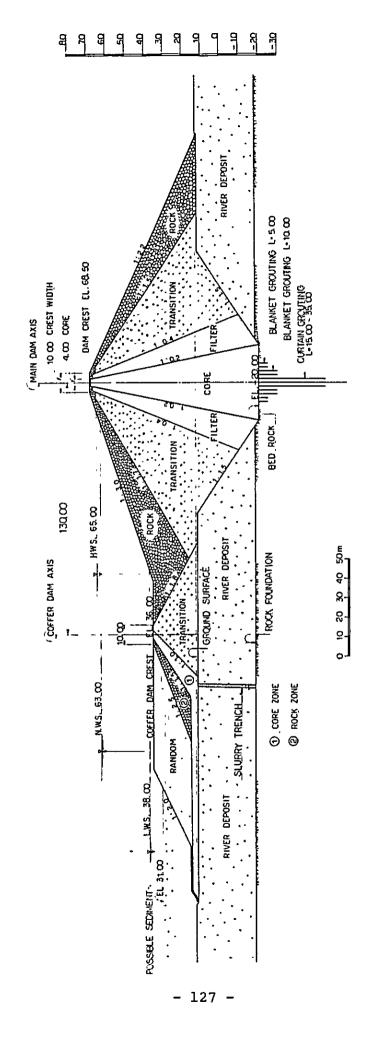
TYPICAL CROSS SECTION OF DAM
